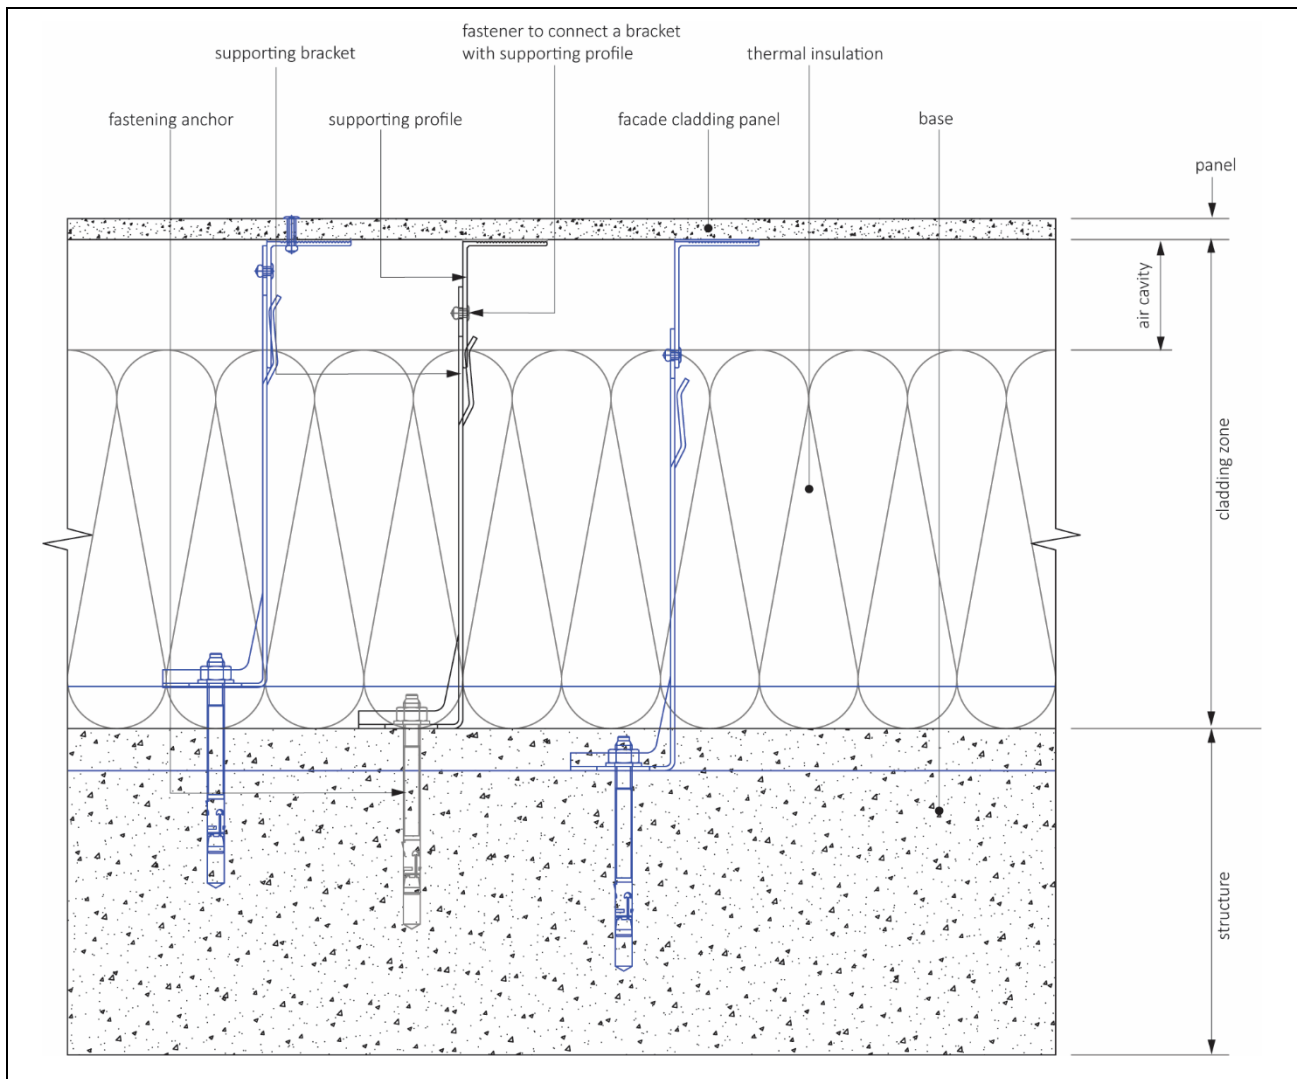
Installation detail of VitraFix VFM System – horizontal cross-section
